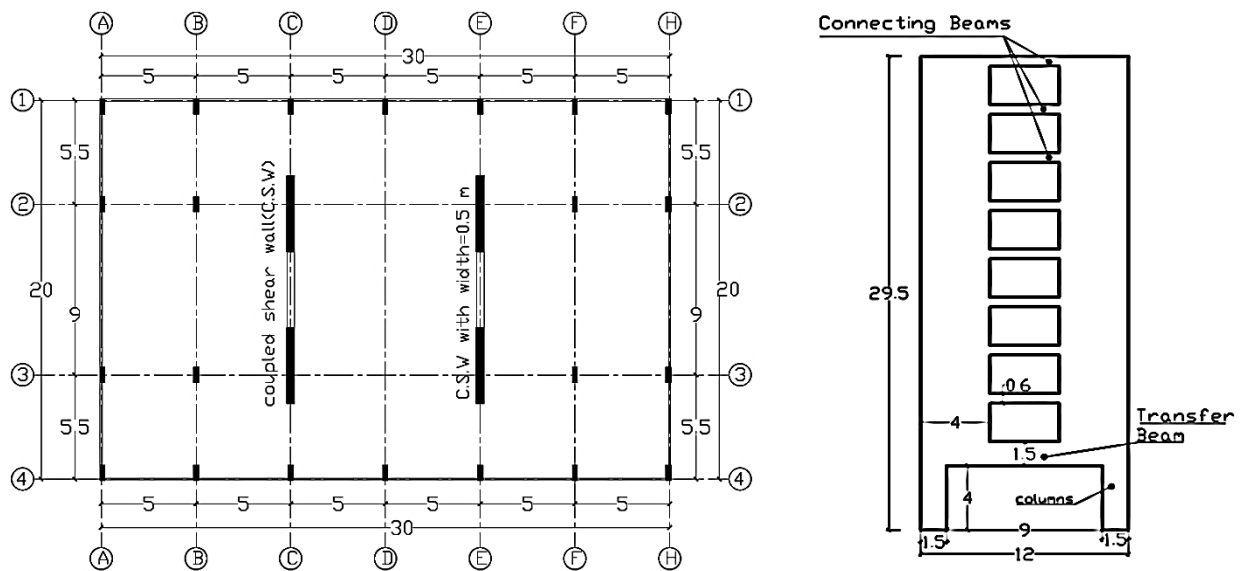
Plan and elevation of the coupled shear walls supported on columns
